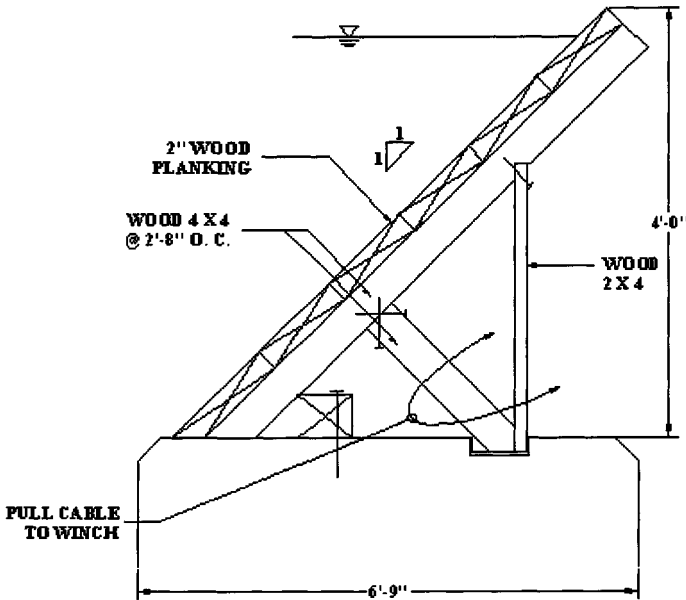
Pelzer Dam Redesigned Flashboard Configuration
